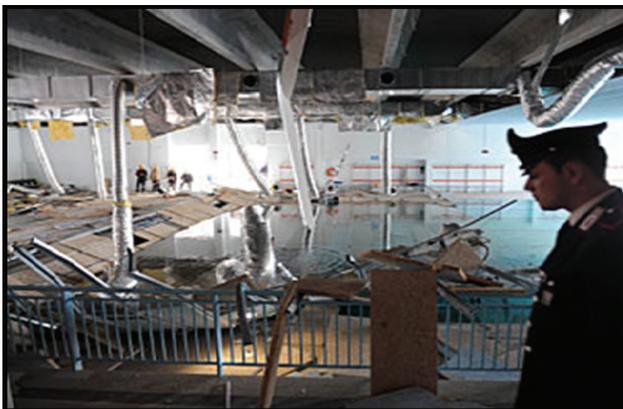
Swimming pool: failure of ceiling with many injuries.
